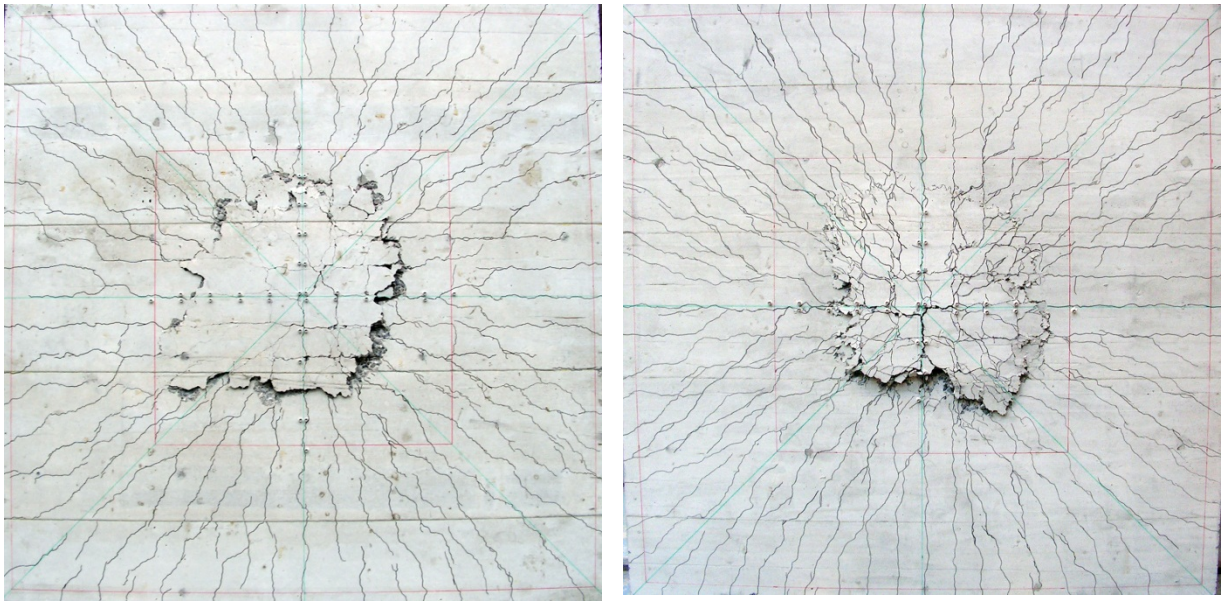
Cracking pattern of plain concrete slab DA-0 (on left) and SFRC slab DA-fm 20 (on right)
